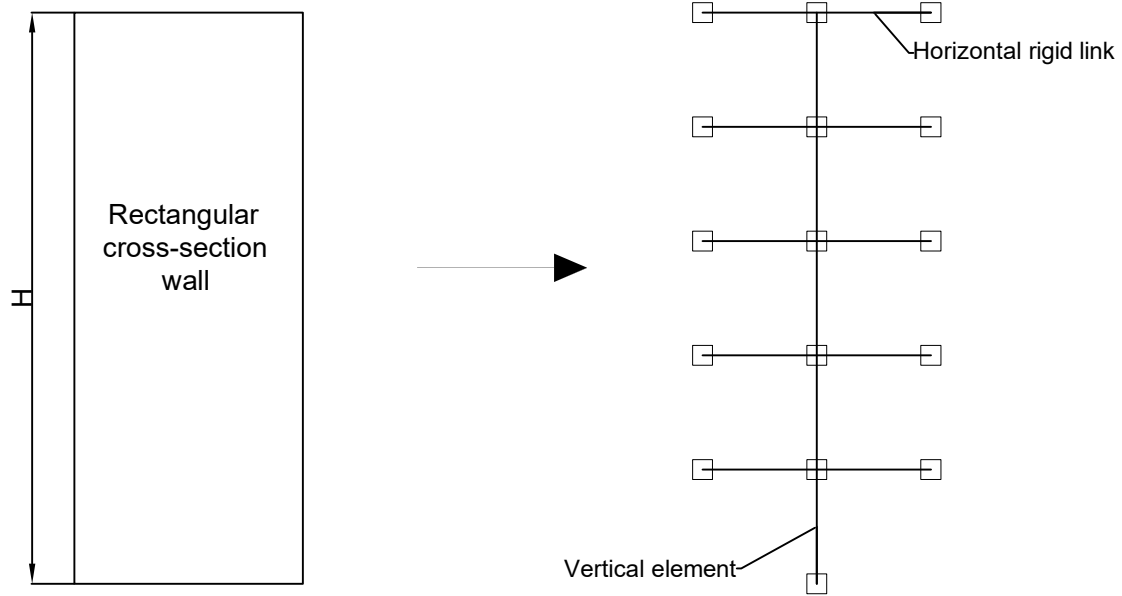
Wide-Column model of a rectangular cross-section wall like G10
